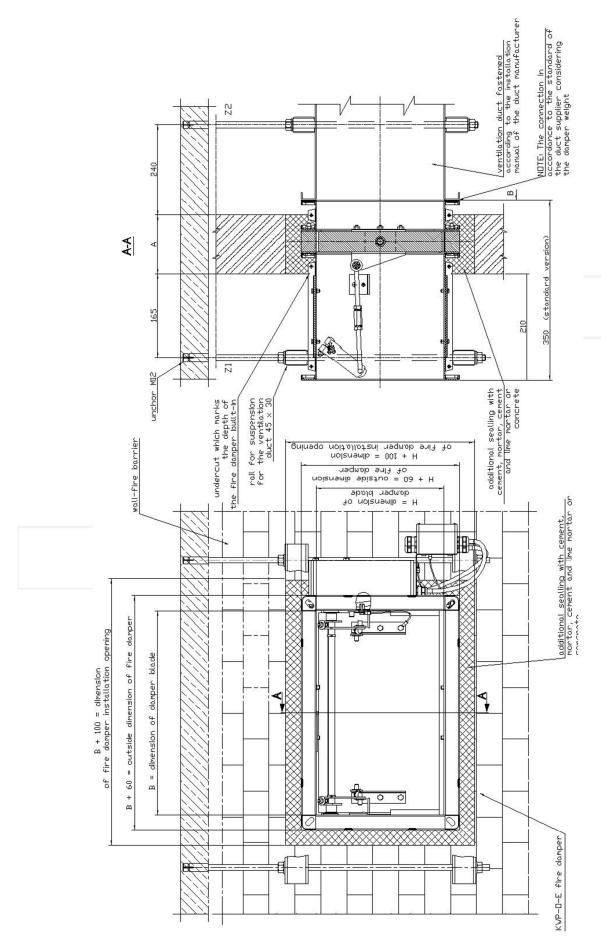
Installation method of fire dampers KWP-O in rigid wall
